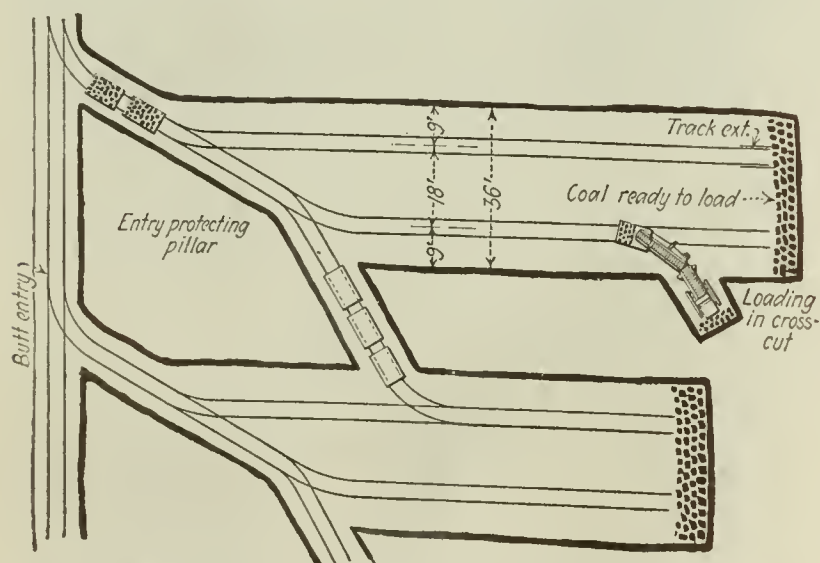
PLATE VI. LAYOUT WITH DOUBLE-TRACK ROOM
